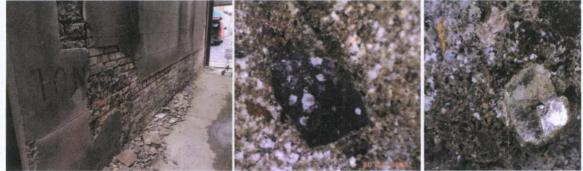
The north end of the east wall is coated with a Portland Cement render above a c.1920s yellow stock brick masonry substrate.
